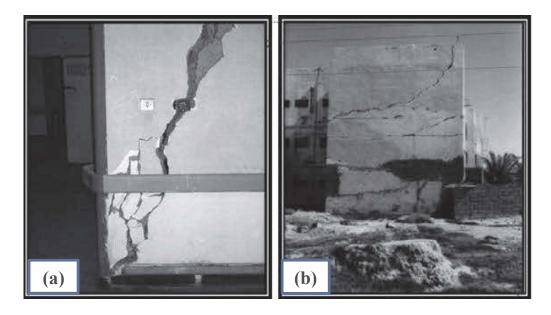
Failures of building constructed on gypseous soils: (a) wall cracks in Dijla Hospital in Tikrit; (b) failure of building in Al-Ramadi city (after Tawfeeq, 2009)
